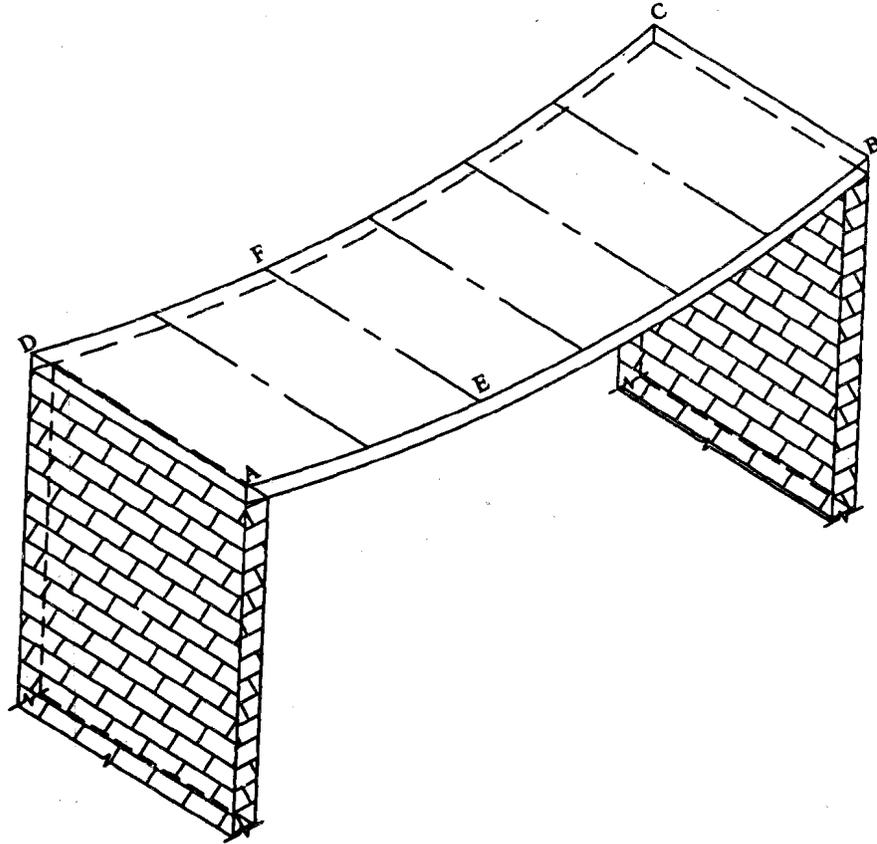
Bending of One Way Slab Supported on Two Opposite Edges
